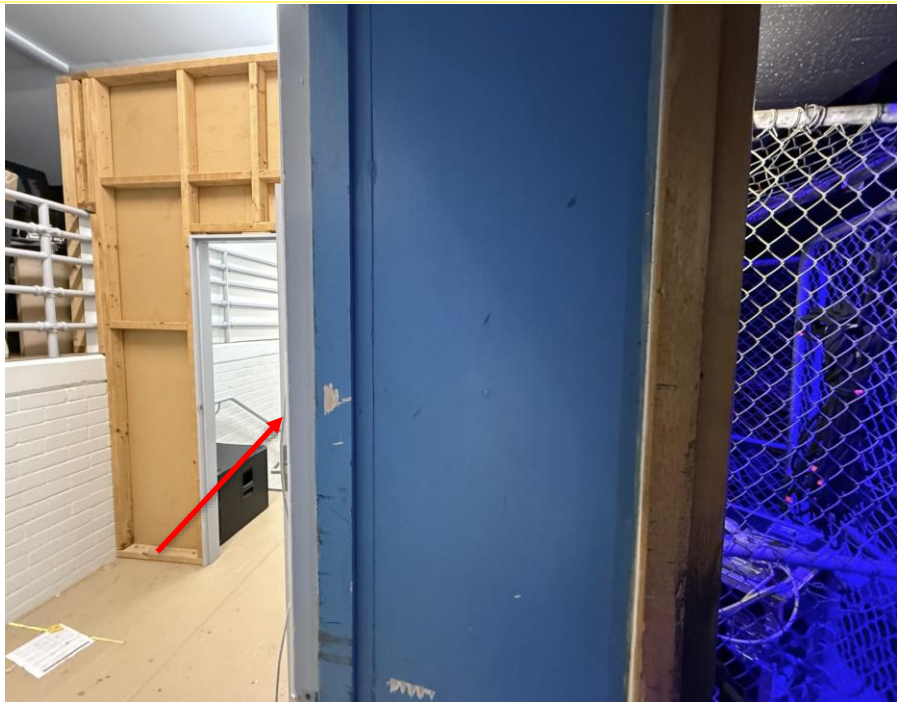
Blue lead containing paint on doors and door frames surrounding backstage in Centenary Hall
